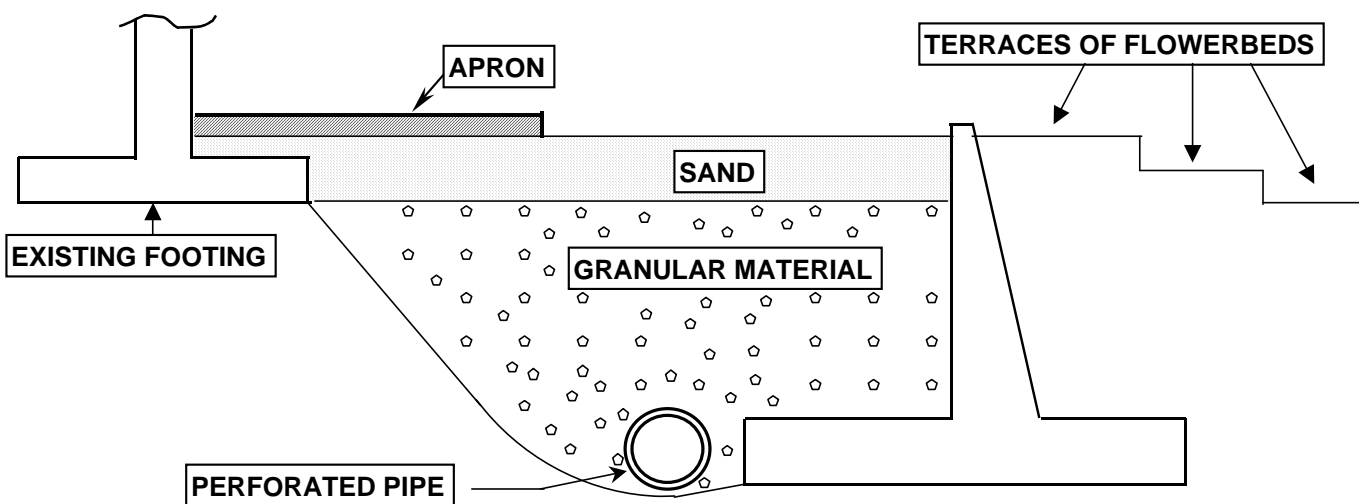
Cross-section of the recommended retaining wall and the drainage system.
